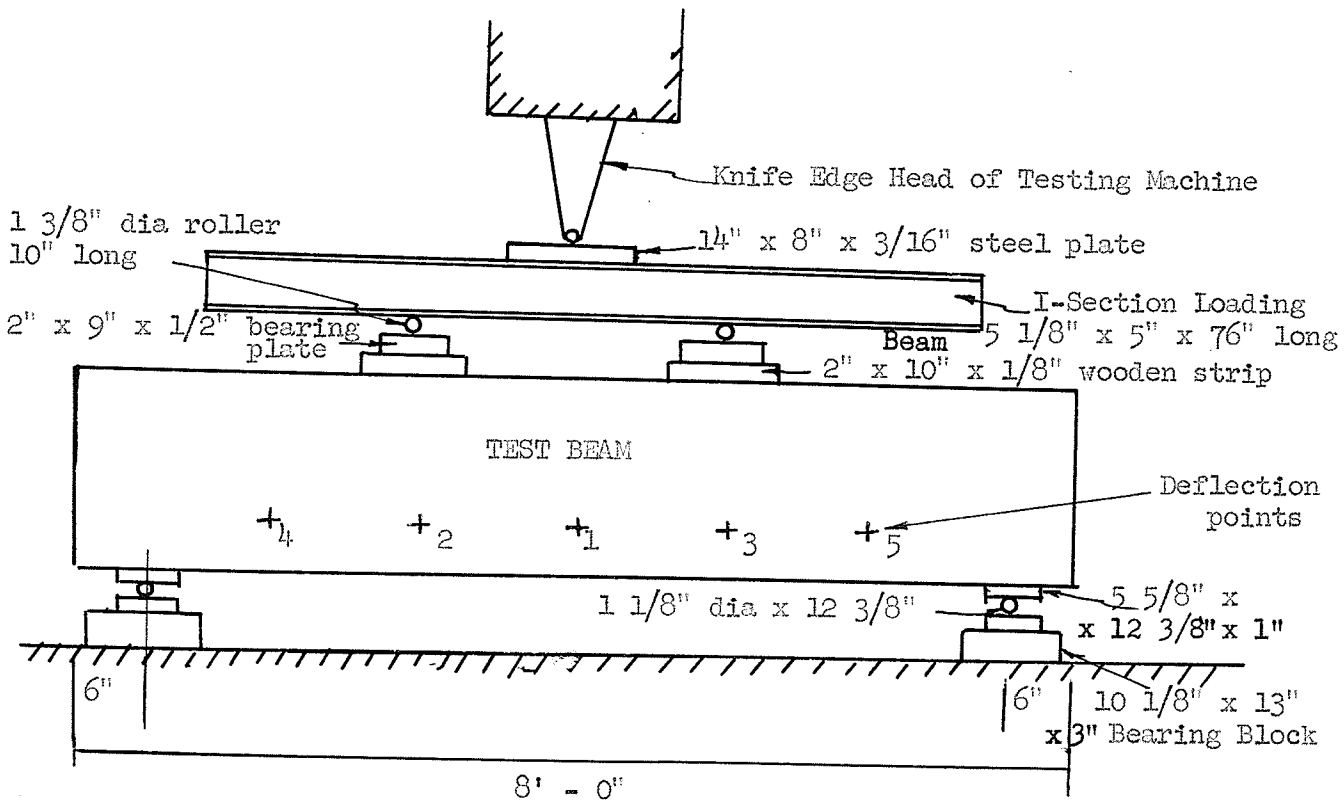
SKETCH SHOWING TESTING ARRANGEMENT
